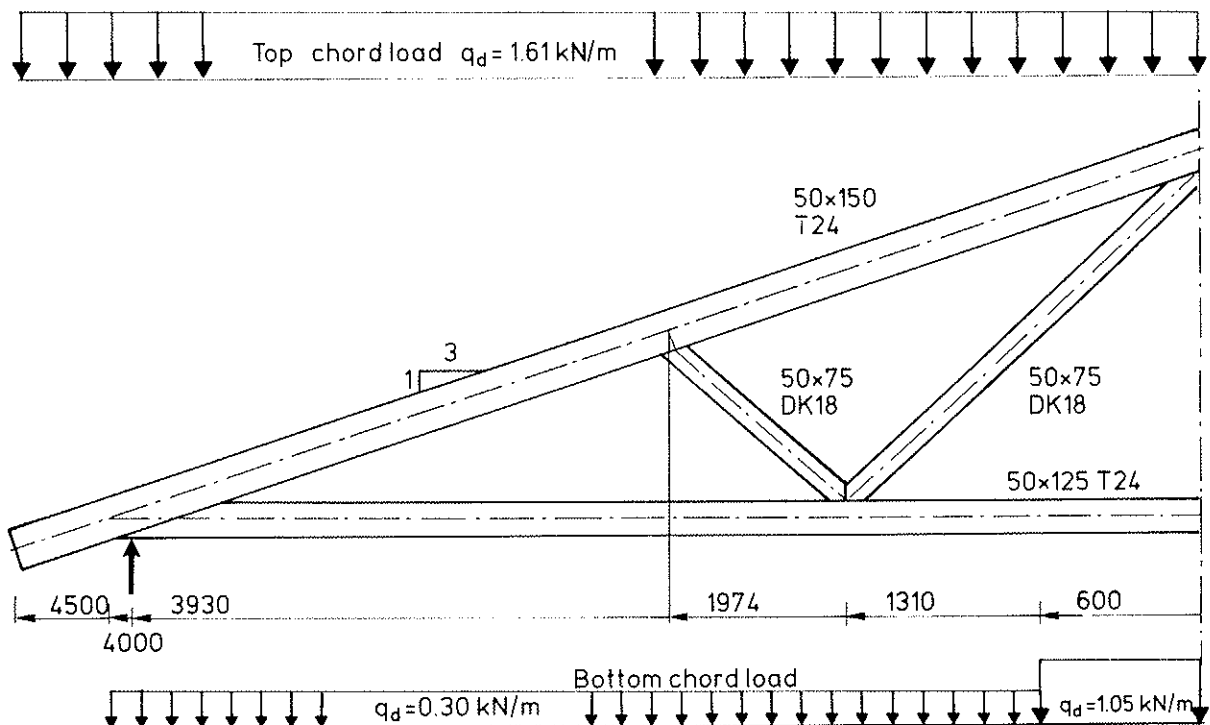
W-truss. Geometry, loading and timber grades and sizes. The truss and the loading has been assumed to be symmetrical.
